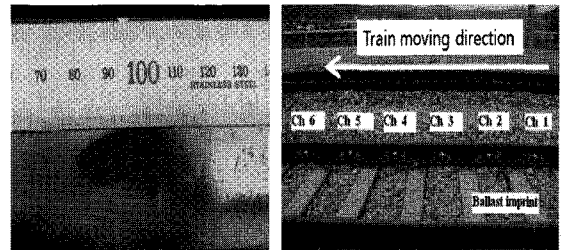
Configuration of a rail surface defect and wheel load increment measurement test setup
